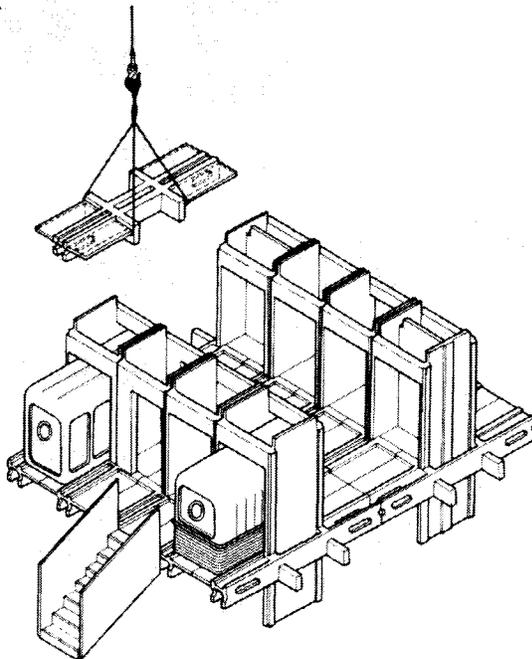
Kisho Kurokawa, *Prefabricated Apartment House*, 1962.
